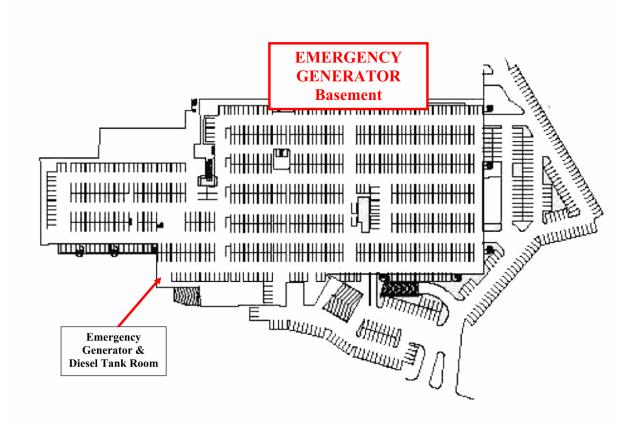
Critical Isolation Plan Basement (Elect Gen)
